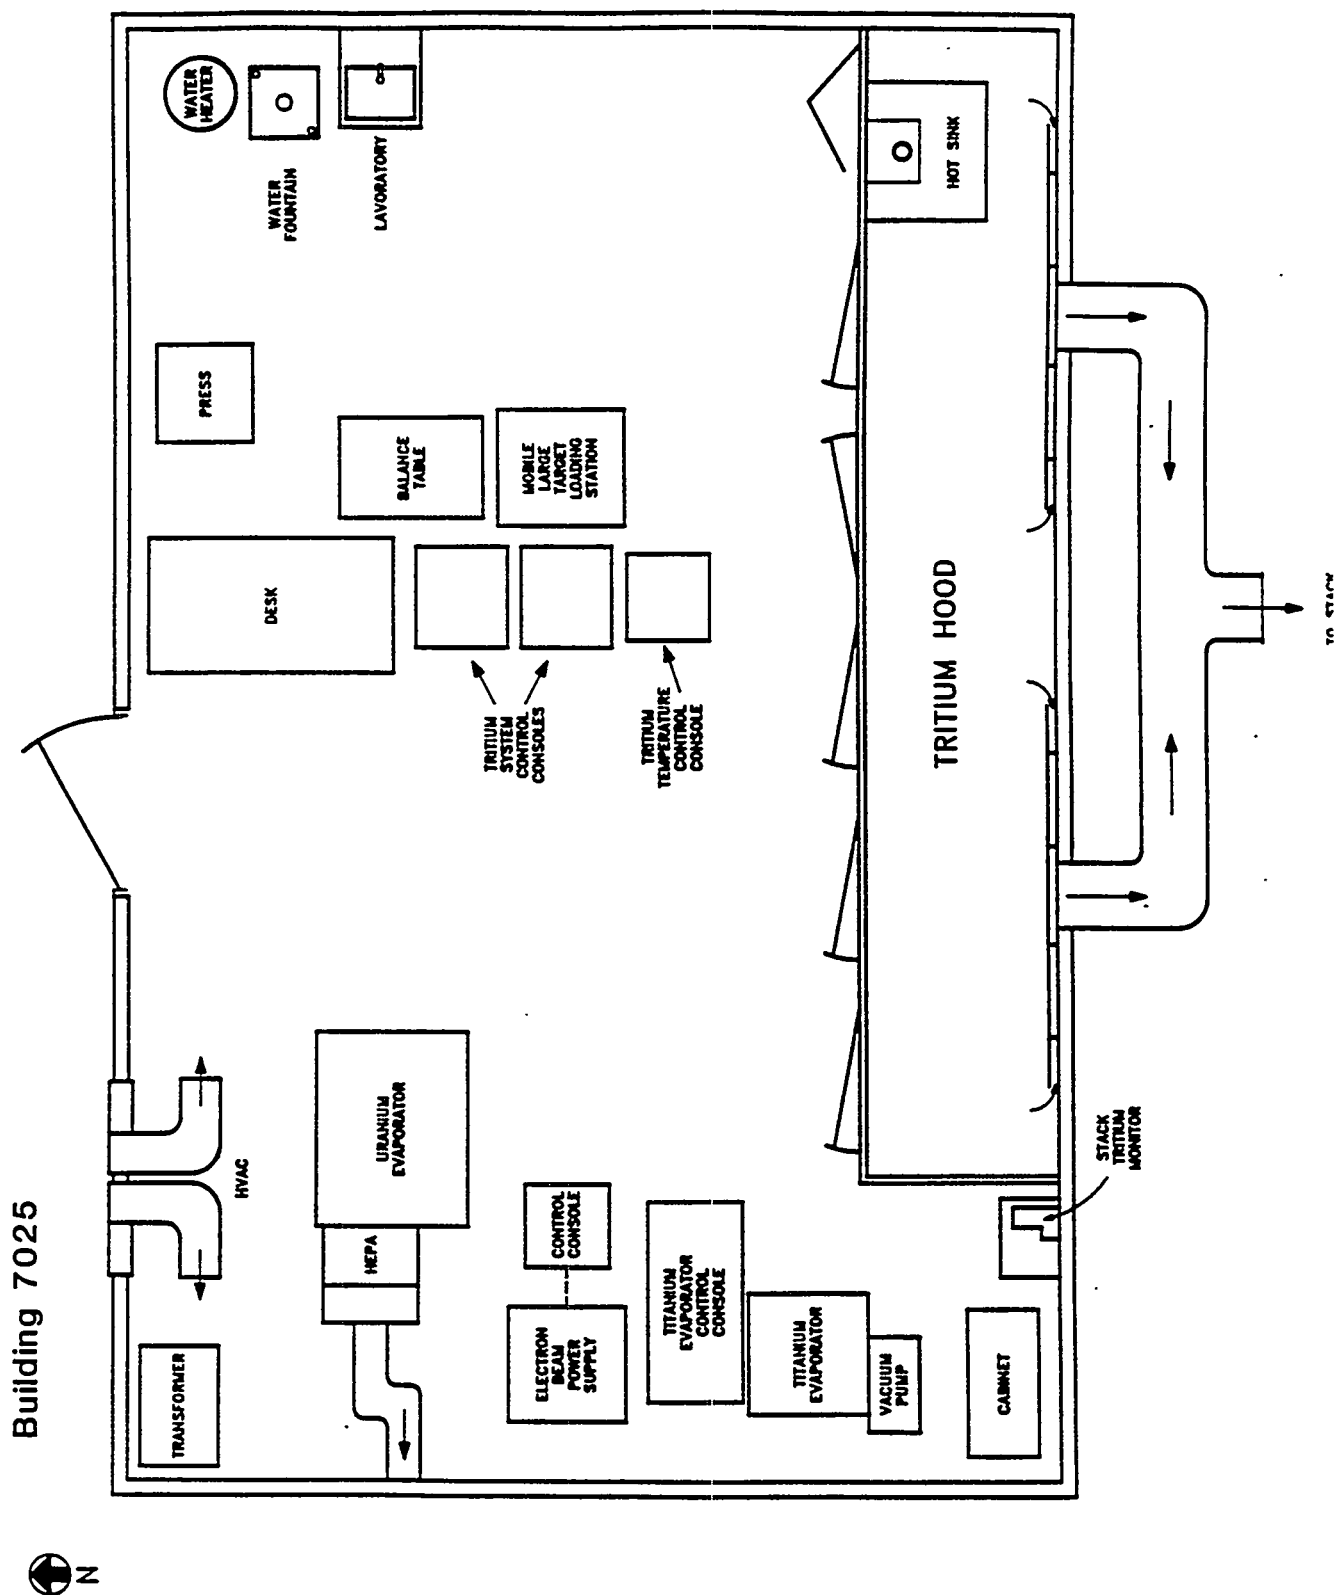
Floor plan of Building 7025—Tritium Target Fabrication.
